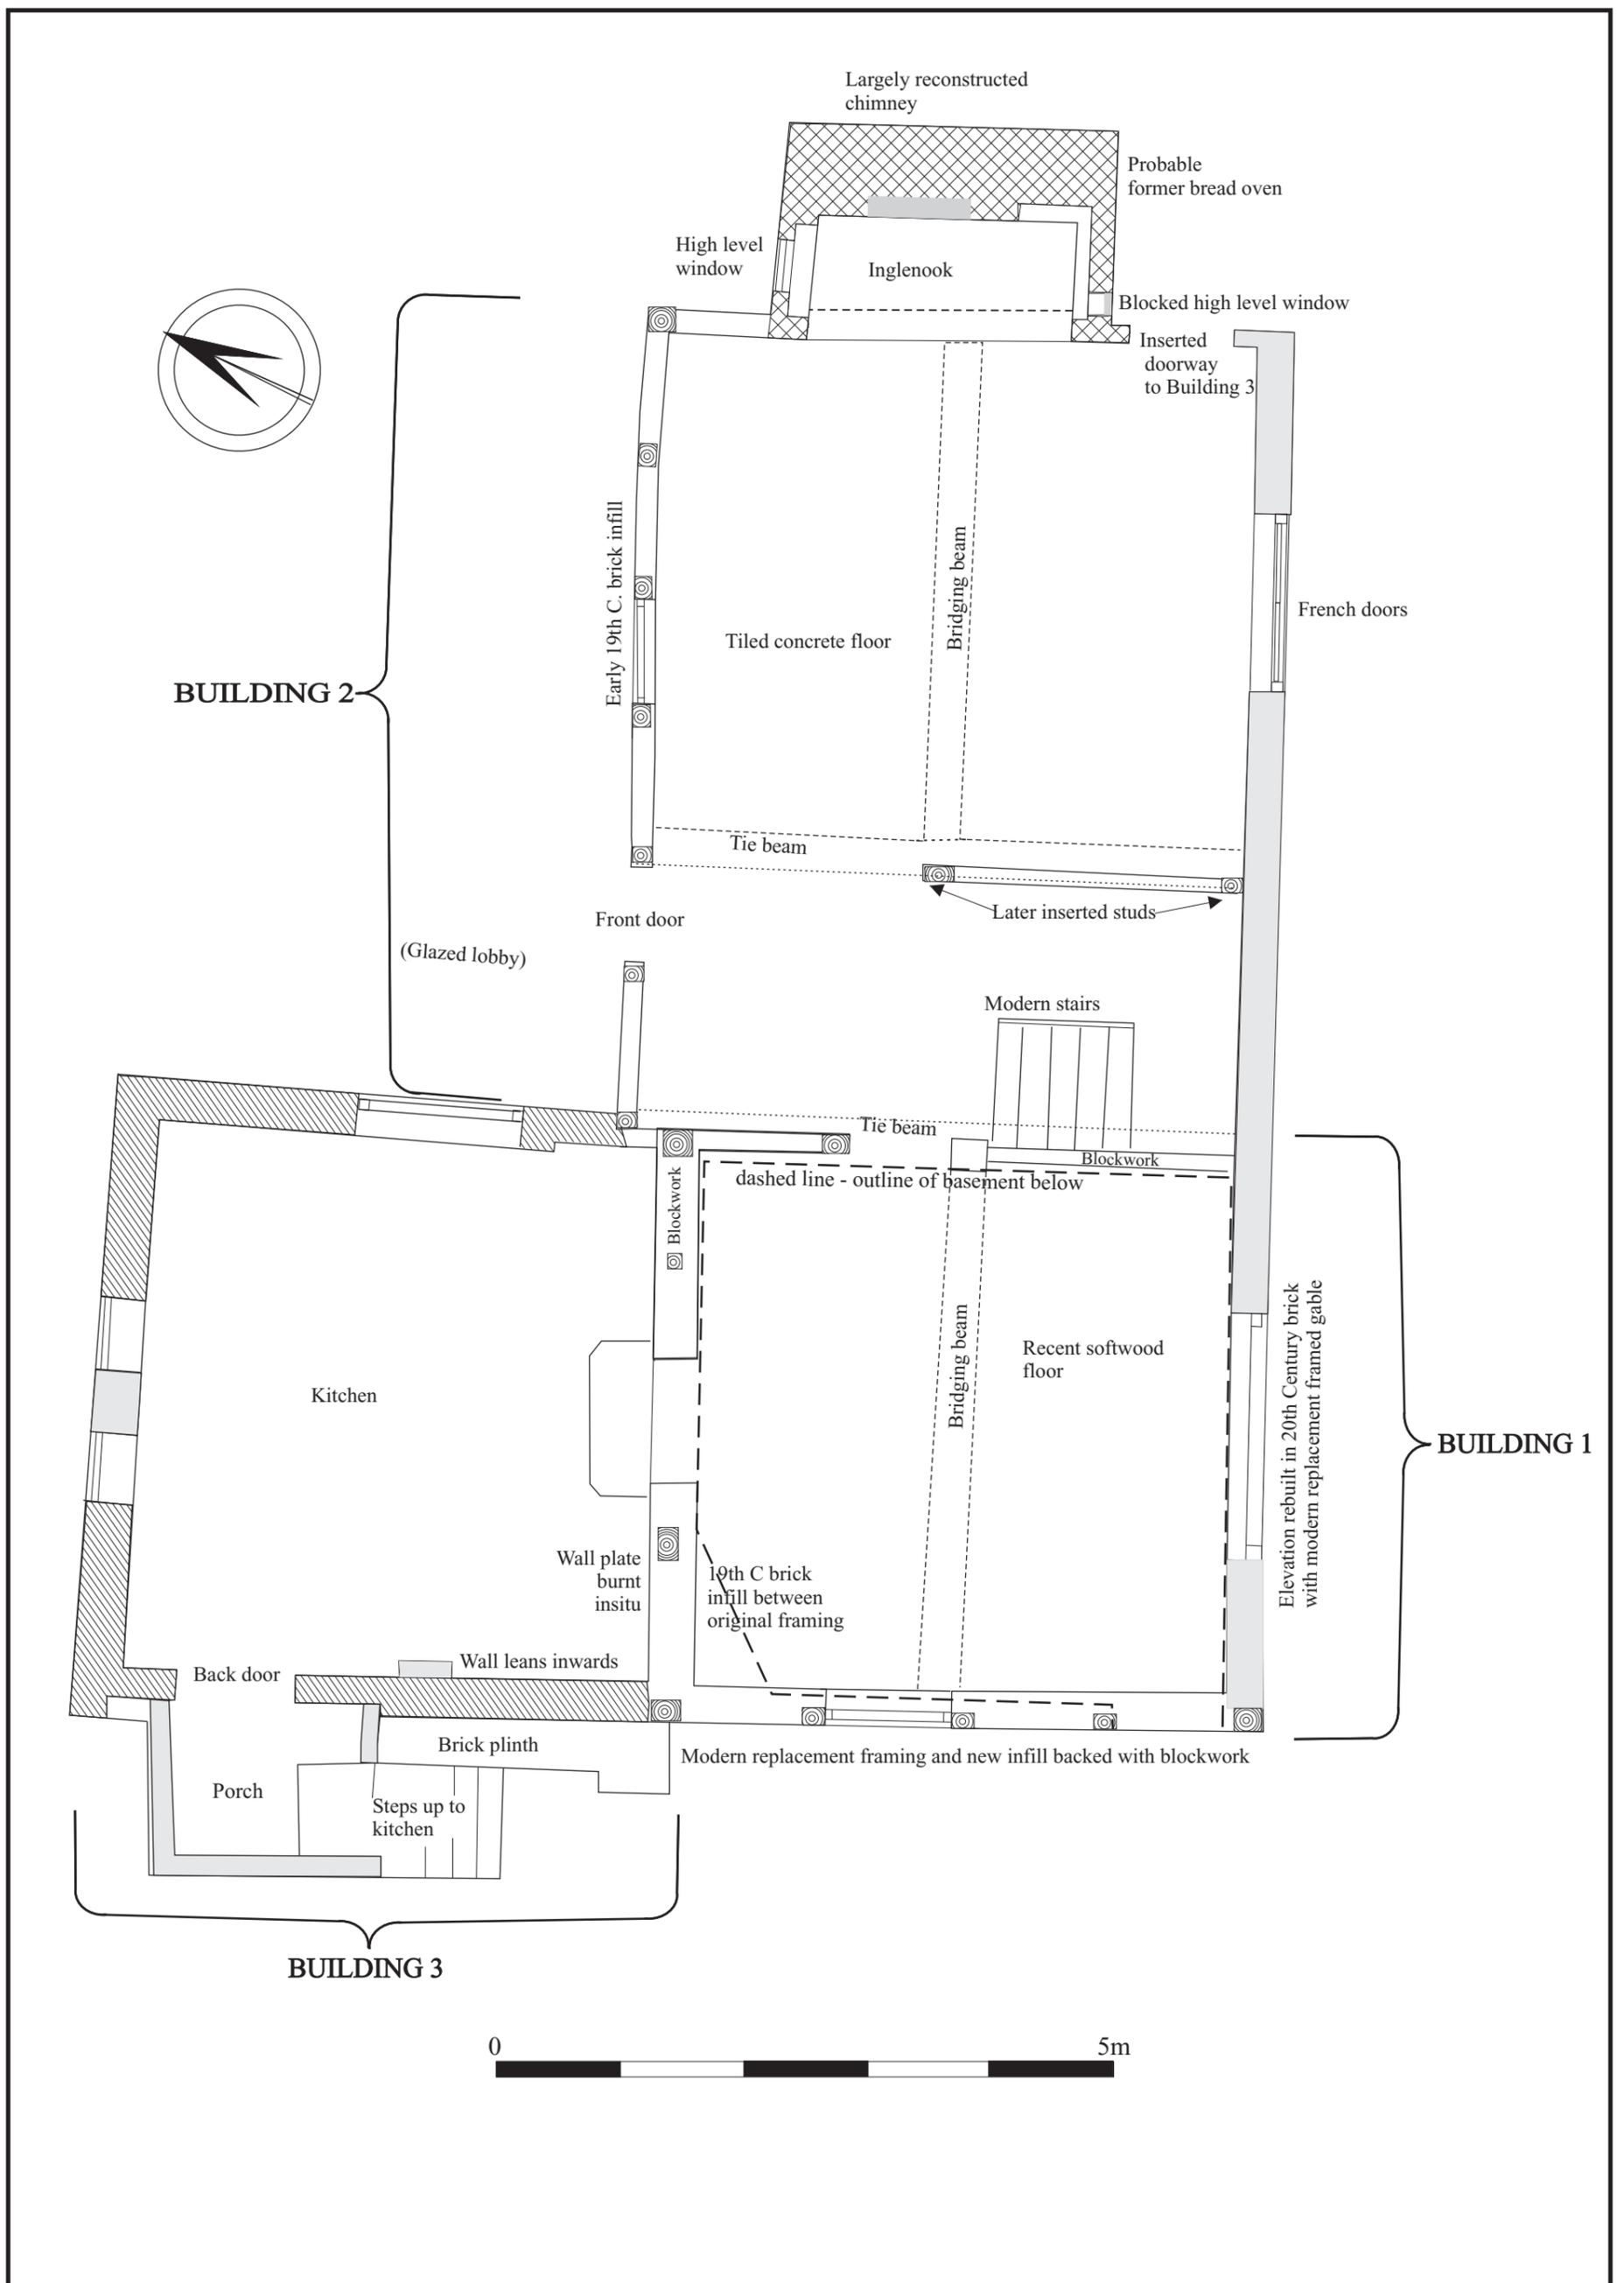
Ground floor plan of historical portion of Winnall Lodge (nb: 20th C extensions largely omitted)
